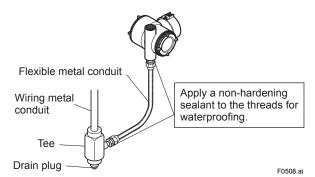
Typical Wiring Using Flexible Metal Conduit
